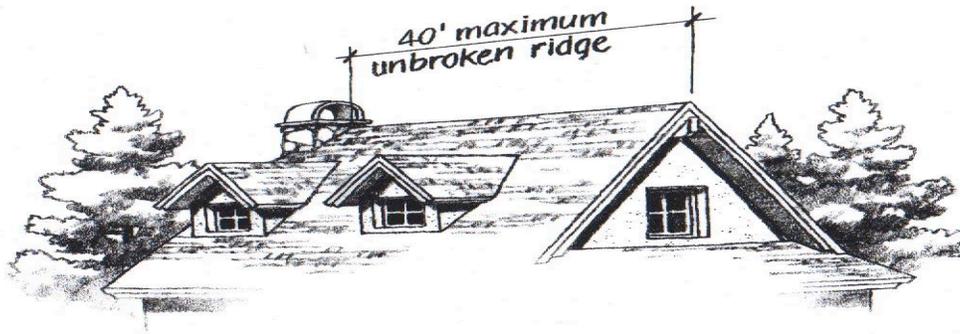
ILLUSTRATION OF ARTICULATED ROOF MASSING
